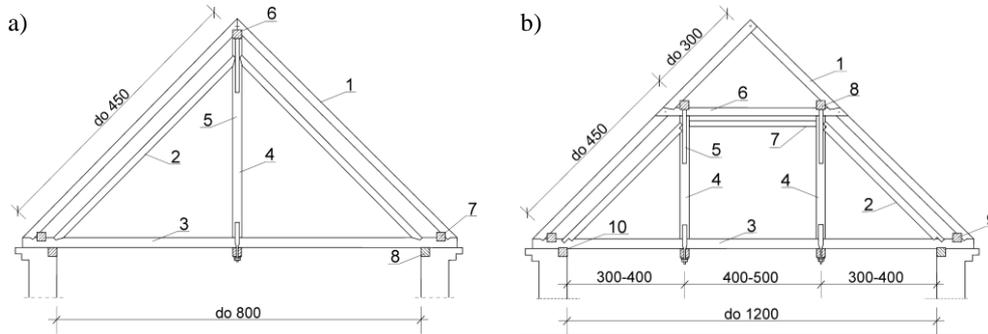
a) King-rod roof (joggle-truss roof) - with one king rod: 1 - rafter, 2 - angle brace, 3 - wooden bowstring (knee-brace), 4 - king rod, 5 - angle brace, 6 - comb board, 7 - "foot" purlin, 8 - plate
